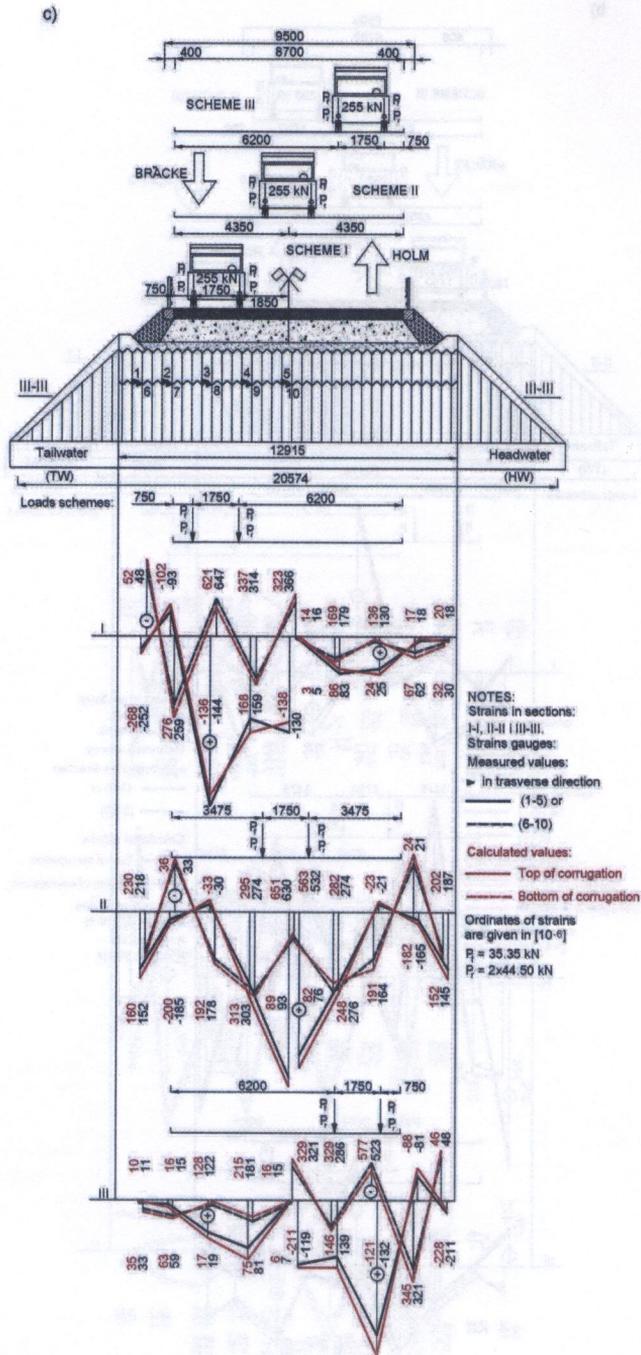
Graphs of maximum strains in selected points (gauges no. 1-20 in longitudinal direction) of steel shell structure in cross-sections of the span: c) III-III.
